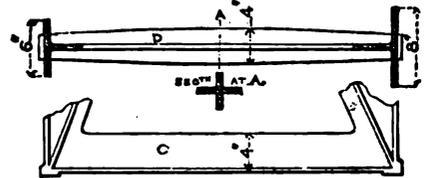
Front and Side Elevations of Ends of cast-iron Girder.
